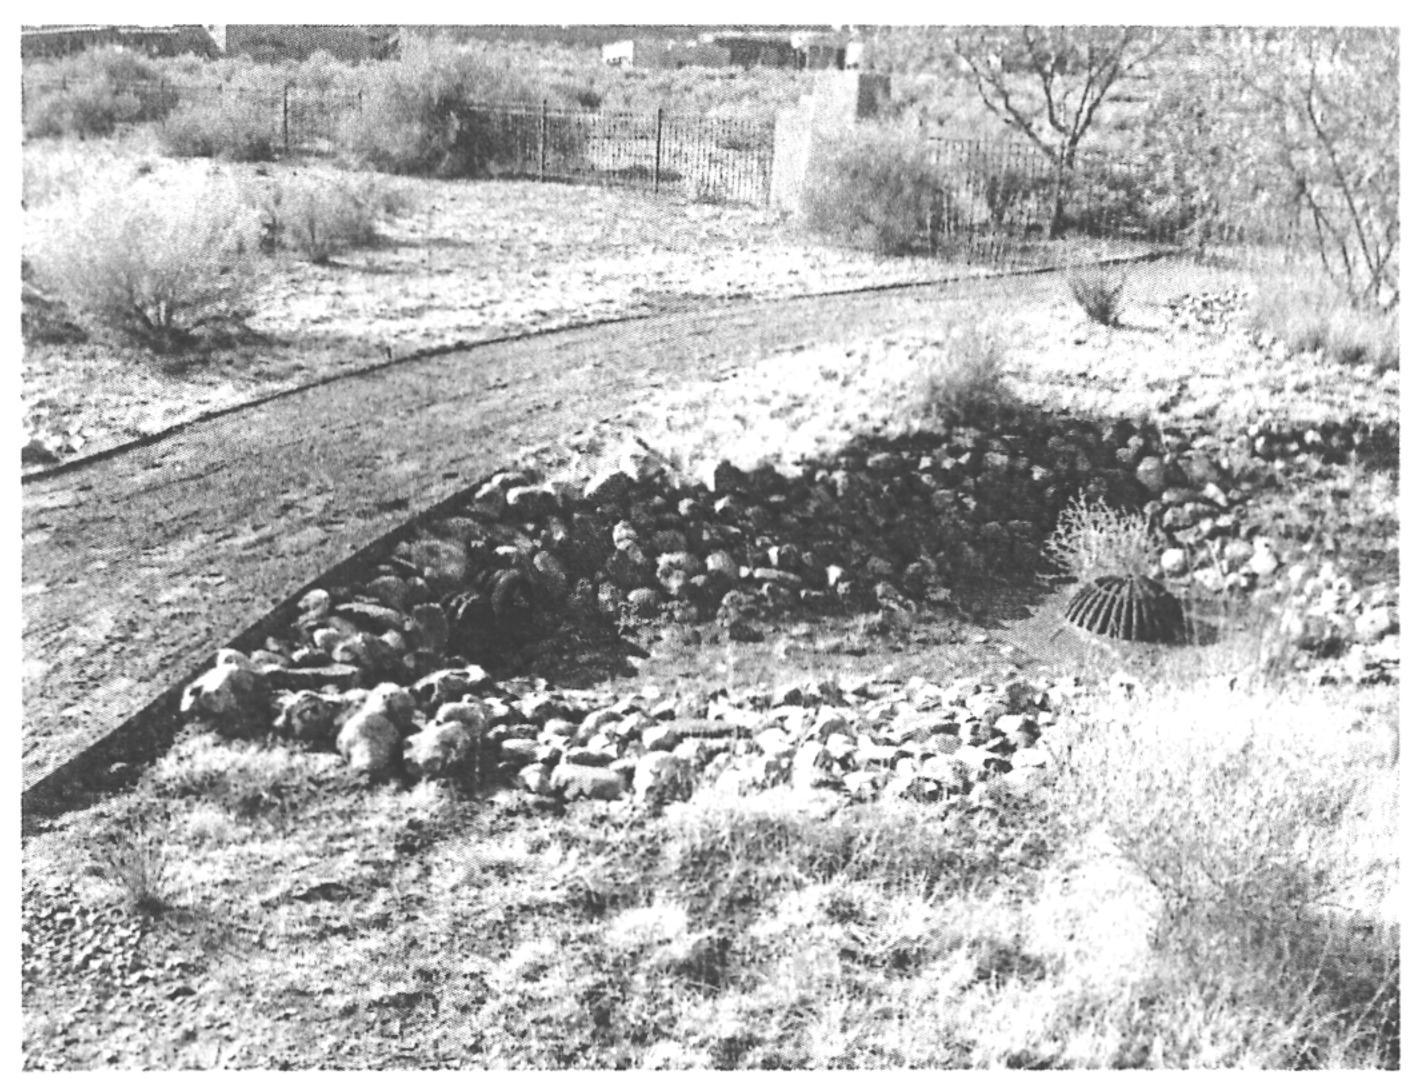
Looking west from trail at culvert E and bee-hive grate #1
